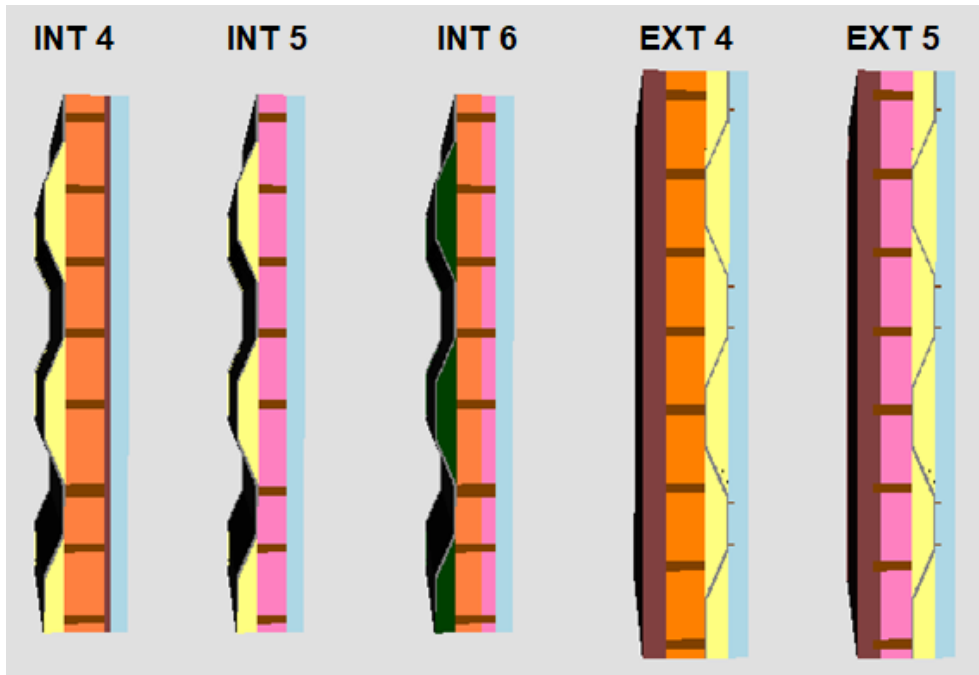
3D AnTherm improved wall construction views according to Table 6
